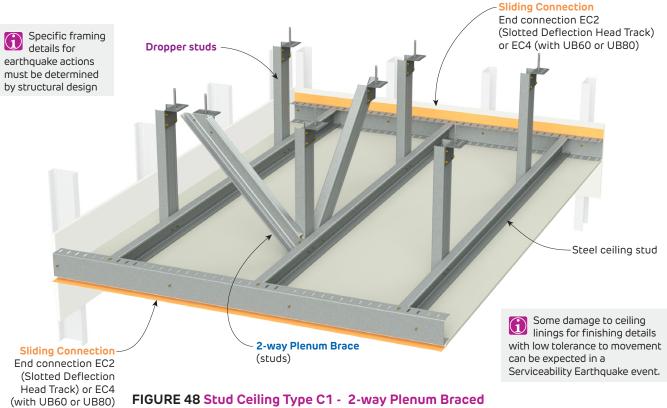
Stud Ceiling Type C1 - 2-way Plenum Braced Perspective
